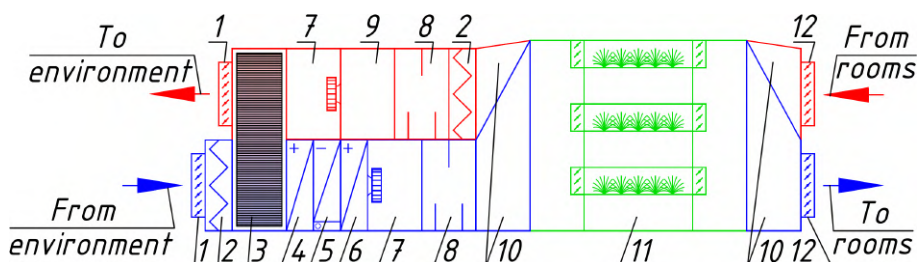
Installation of phytofilter: 1-9 – inlet-exhaust air handling unit; 1 – thermal-insulated valve; 2 – filter; 3 – heat recovery unit (in this scheme – rotor regenerator); 4 – heater; 5 – cooler with condensate diversion; 6 –re-heater; 7 – fan; 8 – sound attenuator; 9 – empty section; 10 – double 3D adapter; 11 – phytofilter; 12 – valve
